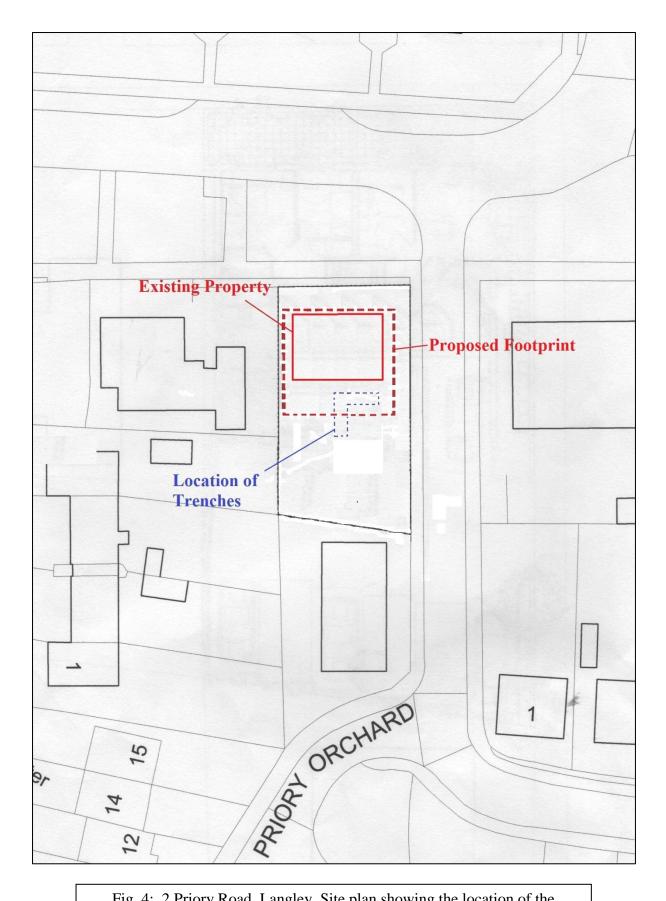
2 Priory Road, Langley. Site plan showing the location of the existing property and the evaluation trenches
